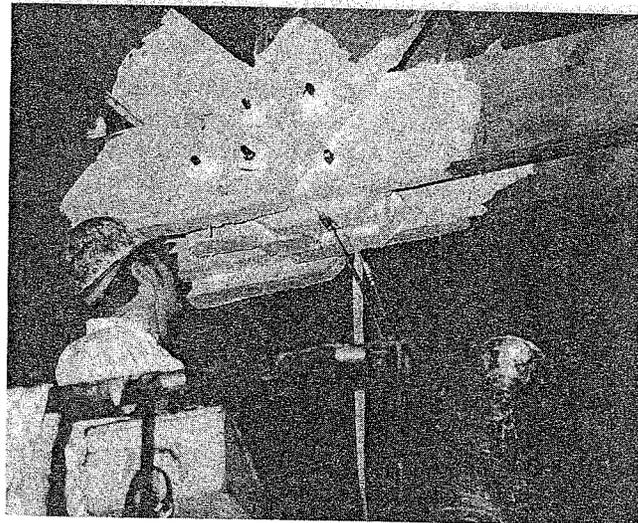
Injecting low-viscosity epoxy into a cracked roof truss
